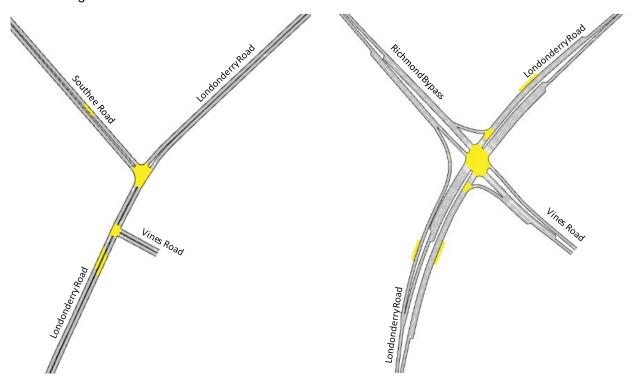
Southee Road, Londonderry Road, Vines Road intersection (Location 10): existing layout (left) and proposed upgrade (right)
